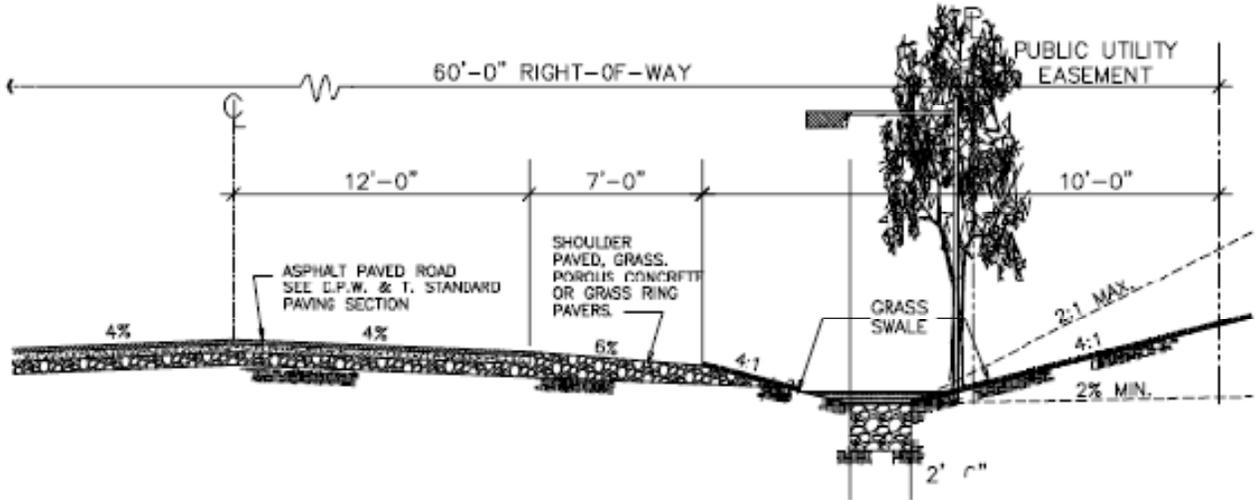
A rural residential right-of-way section has the same 60-foot width, but reduces paving width by 33% to 24 feet, and eliminates the use of concrete curb and gutter
